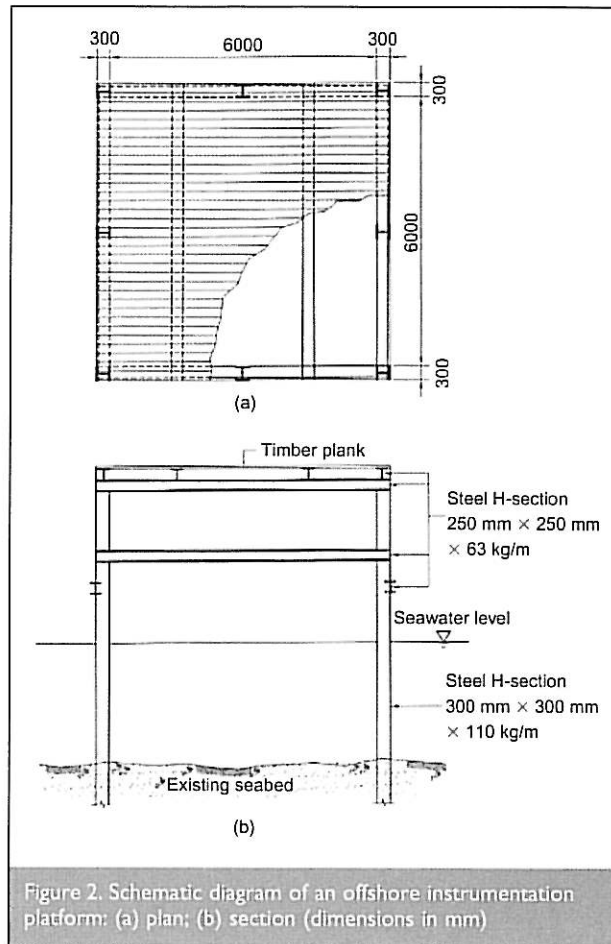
Schematic diagram of an offshore instrumentation platform: (a) plan; (b) section (dimensions in mm)
